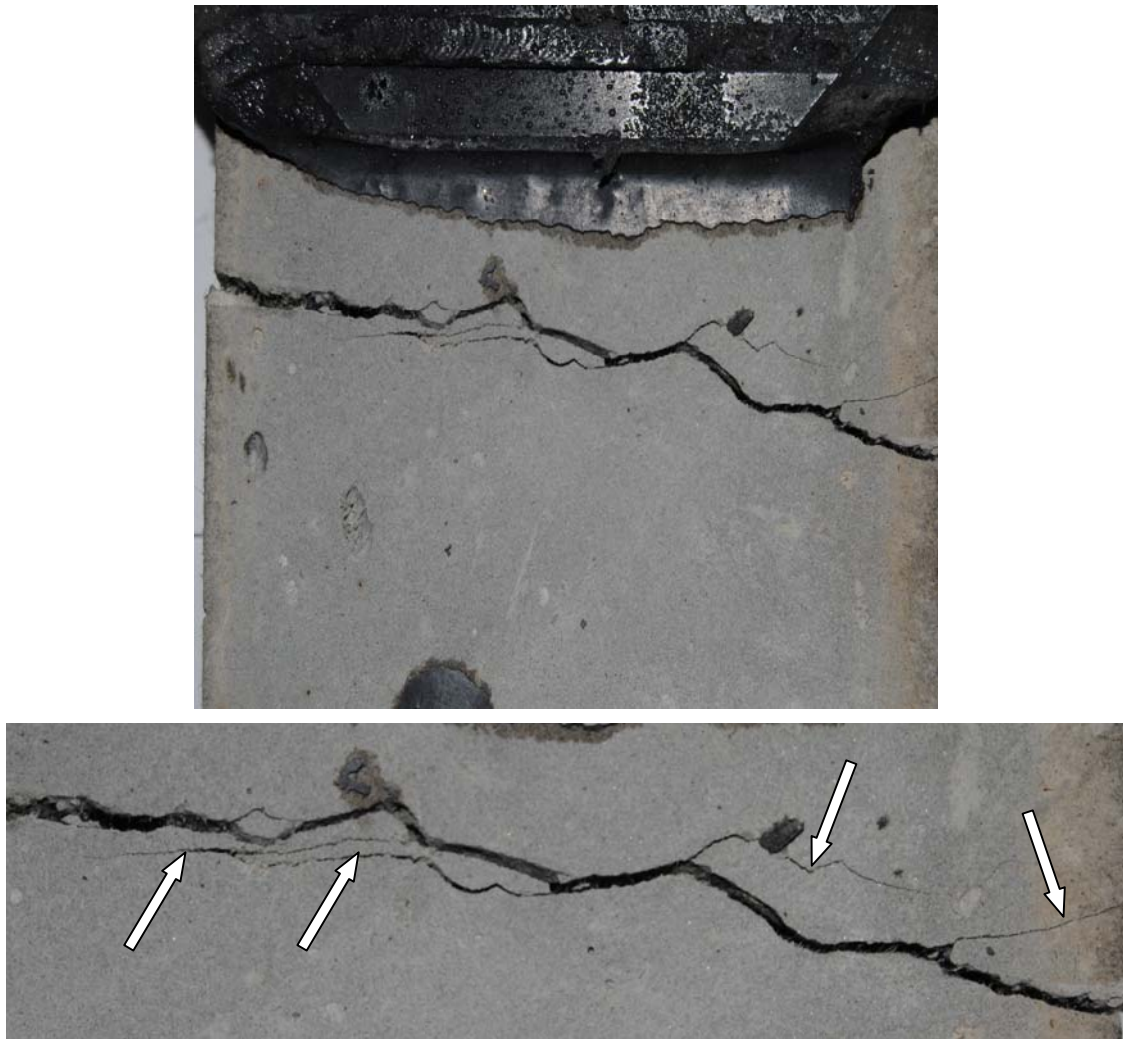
Multiple crack formation on specimen that has failed in compression-tension (Point 5, Figure 3)
